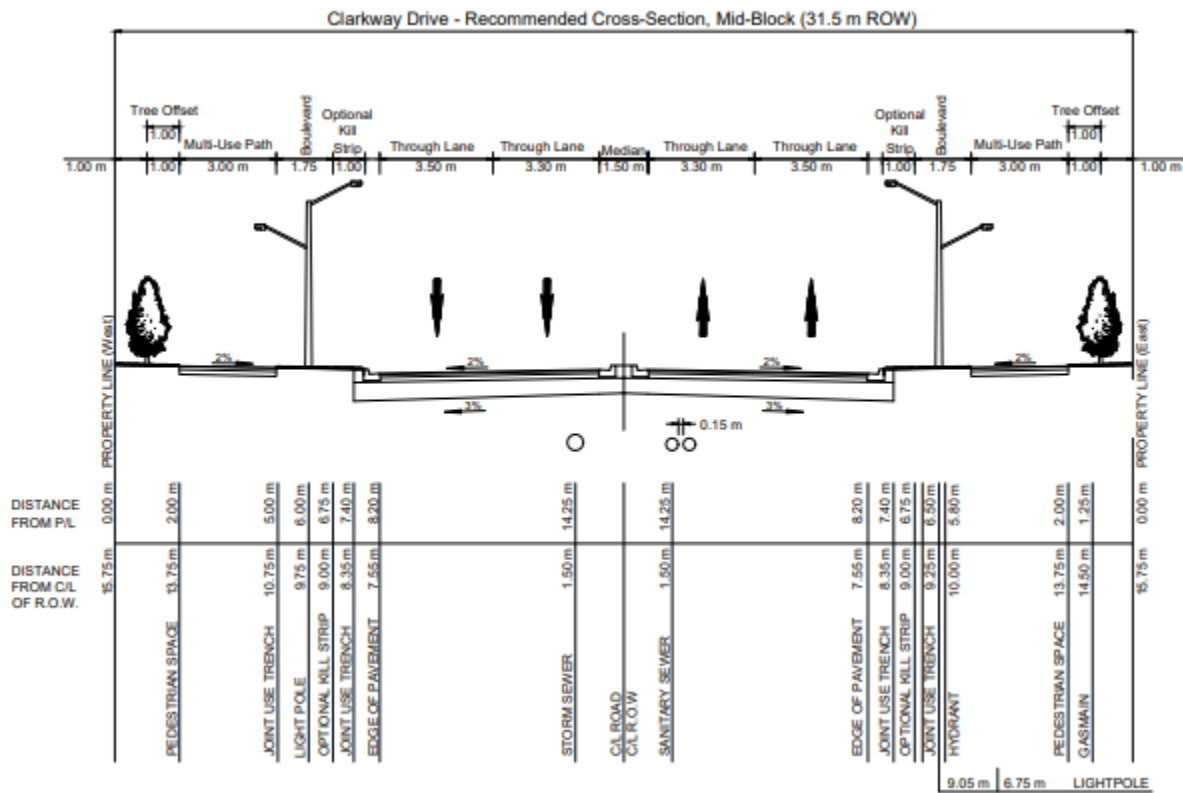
Recommended Cross-Section for the Clarkway Drive: Castlemore Road to Collector Road 'C' with Median
